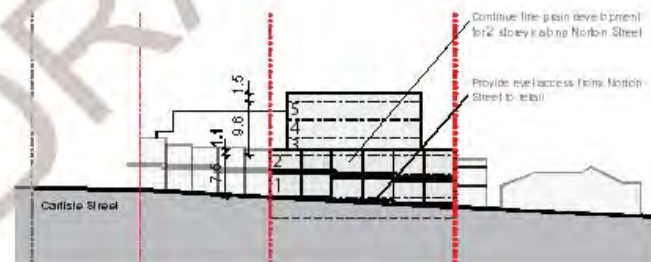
Norton Street - Building envelope - Steel elevation B-B
